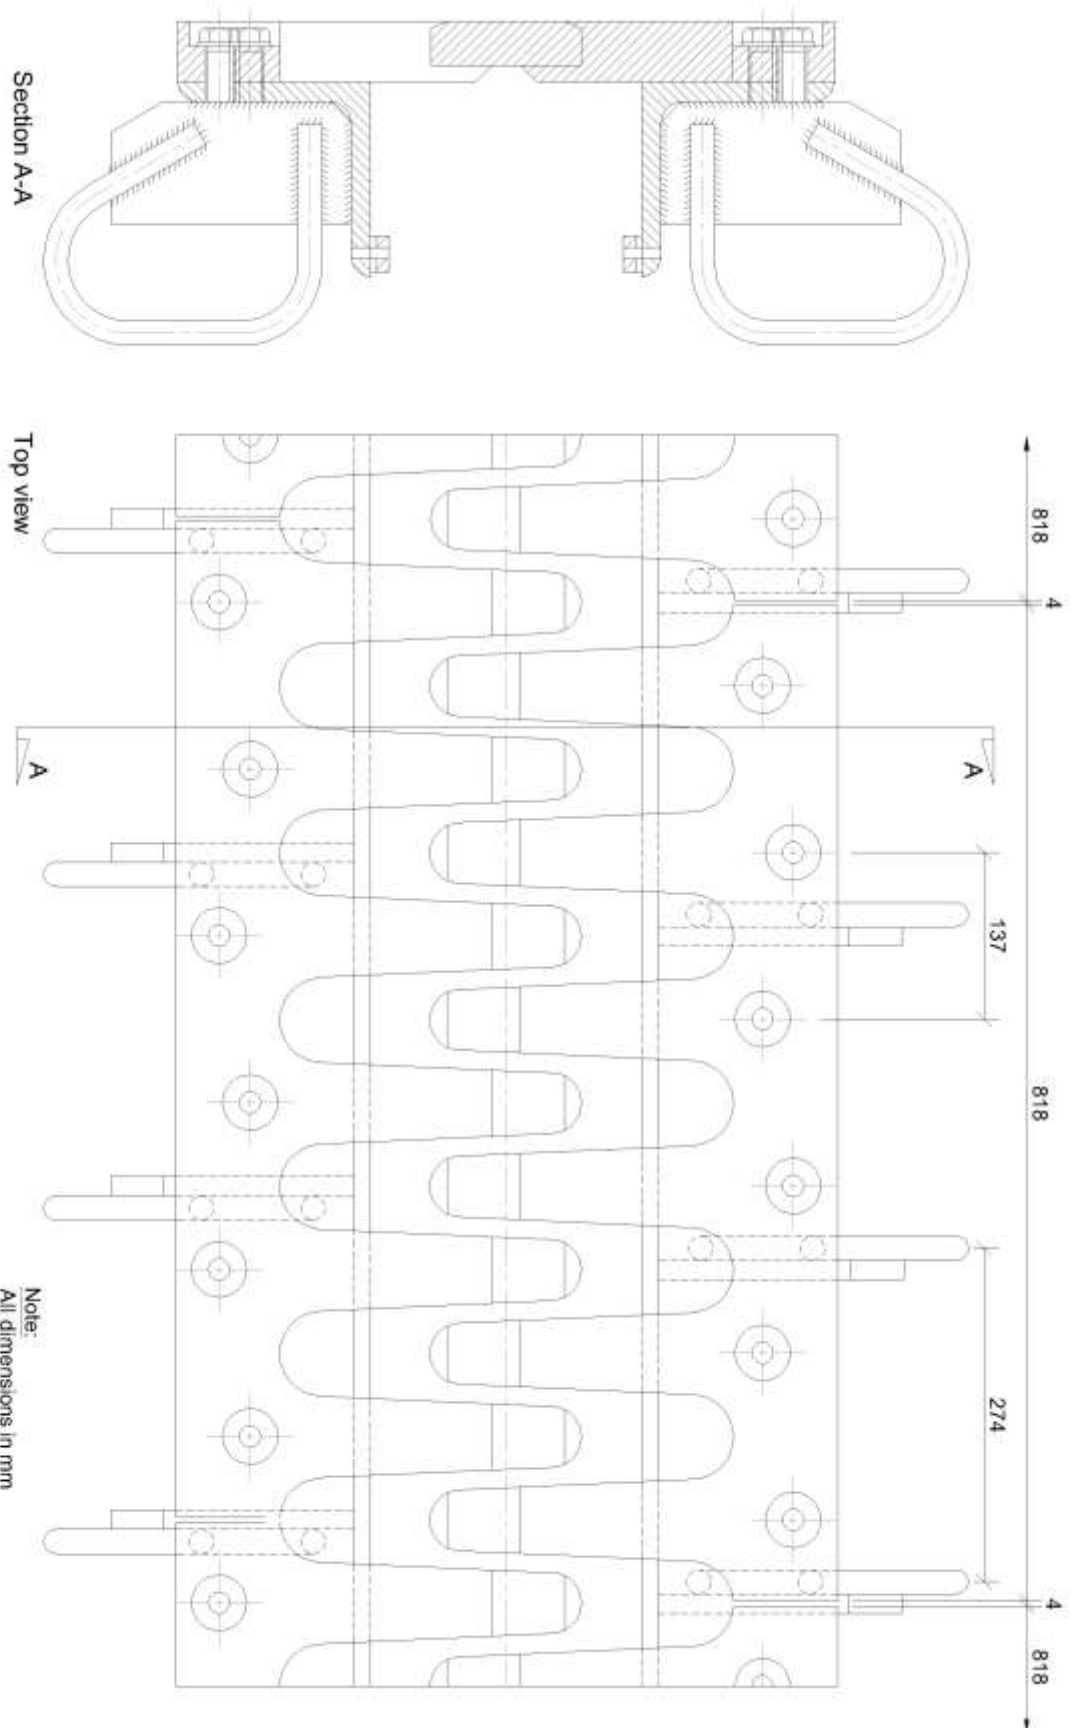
Typical section A-A and top view for Tensa Finger expansion joints ranging from RSFD-B 180 to RSFD-B 500
